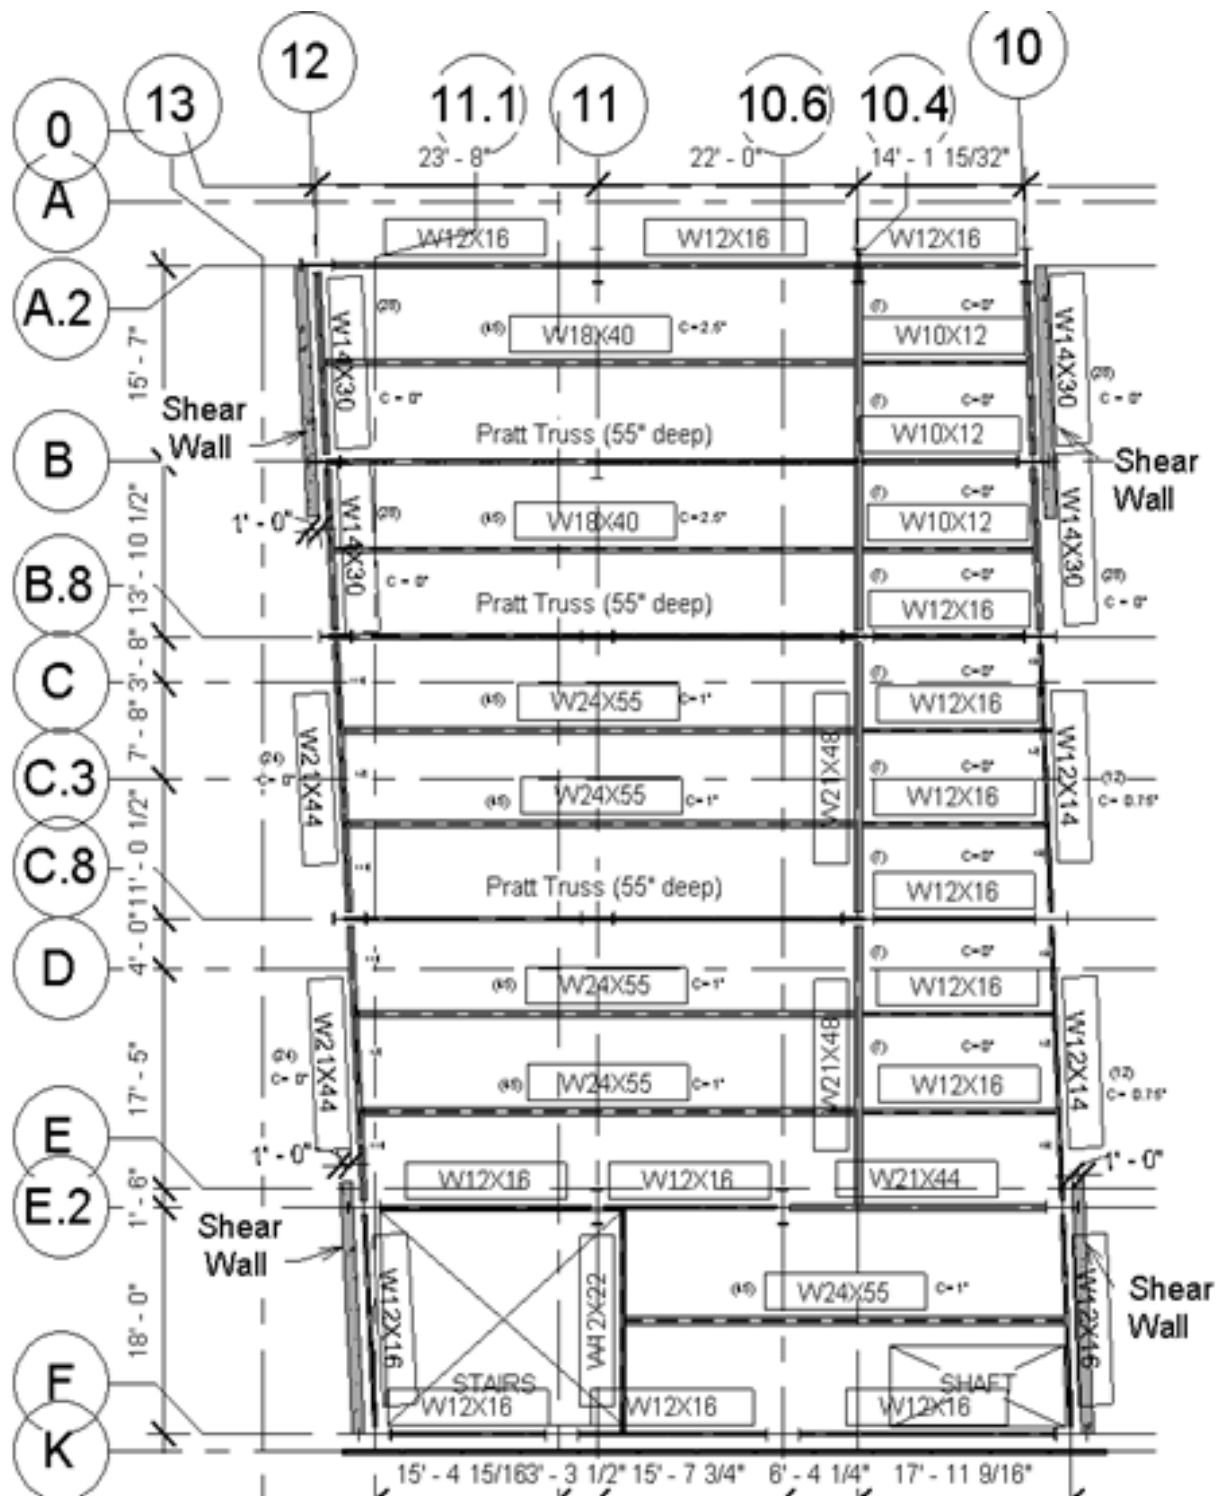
Fifth Floor Framing Layout with Transfer Truss
